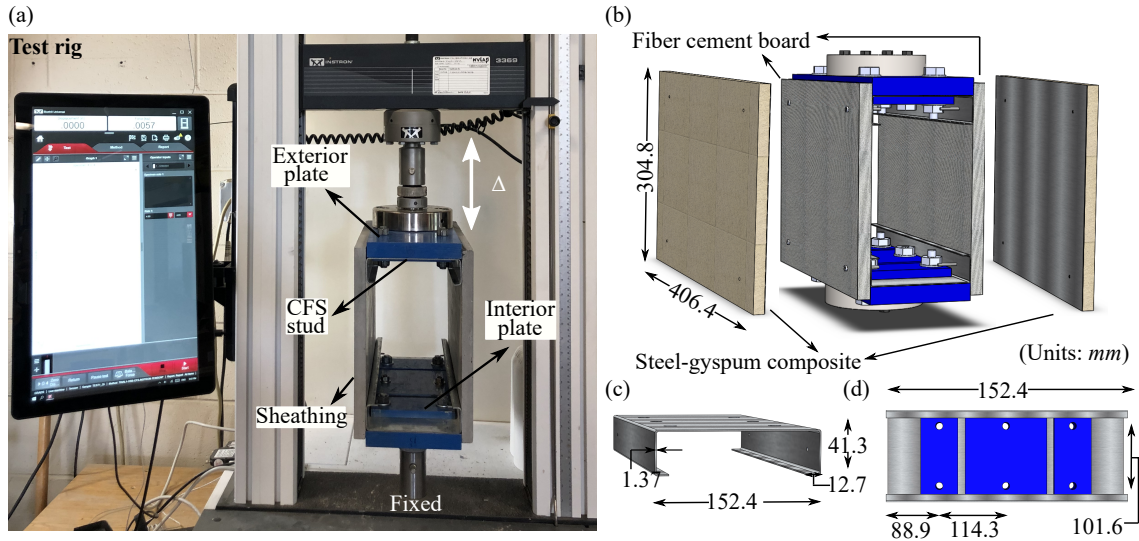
CFS-to-FCB and CFS-to-SG connection specimens and test rig. (a) Actual test specimen photo in INSTRON machine, (b) schematic representation of connection specimens of fiber cement board (FCB) or composite steel-gypsum board (SG) sheathing material, (c) cross-sectional dimensions of CFS studs, and (d) inside specimen view including dimensions of steel plates used to restrain stud webs.
